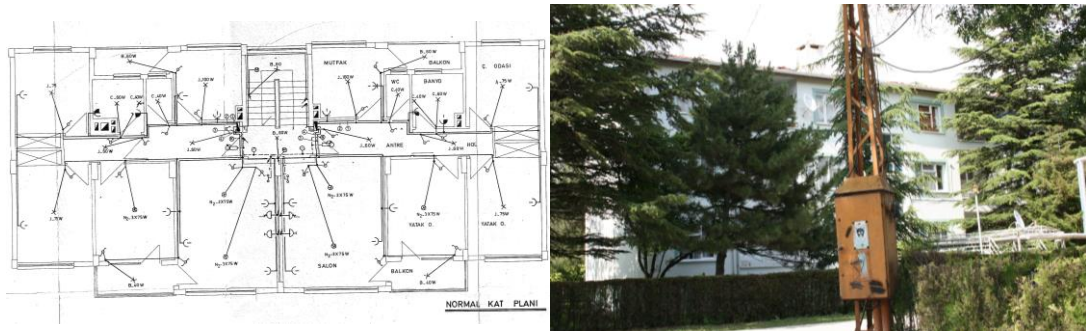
Floor plan drawn (in electricity project) in 1978 and photo taken in 2014 of the second apartment block
